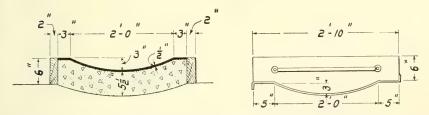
Typical Cross Section of Concrete Gutter and Design for a Template to be Used in Its Construction.
